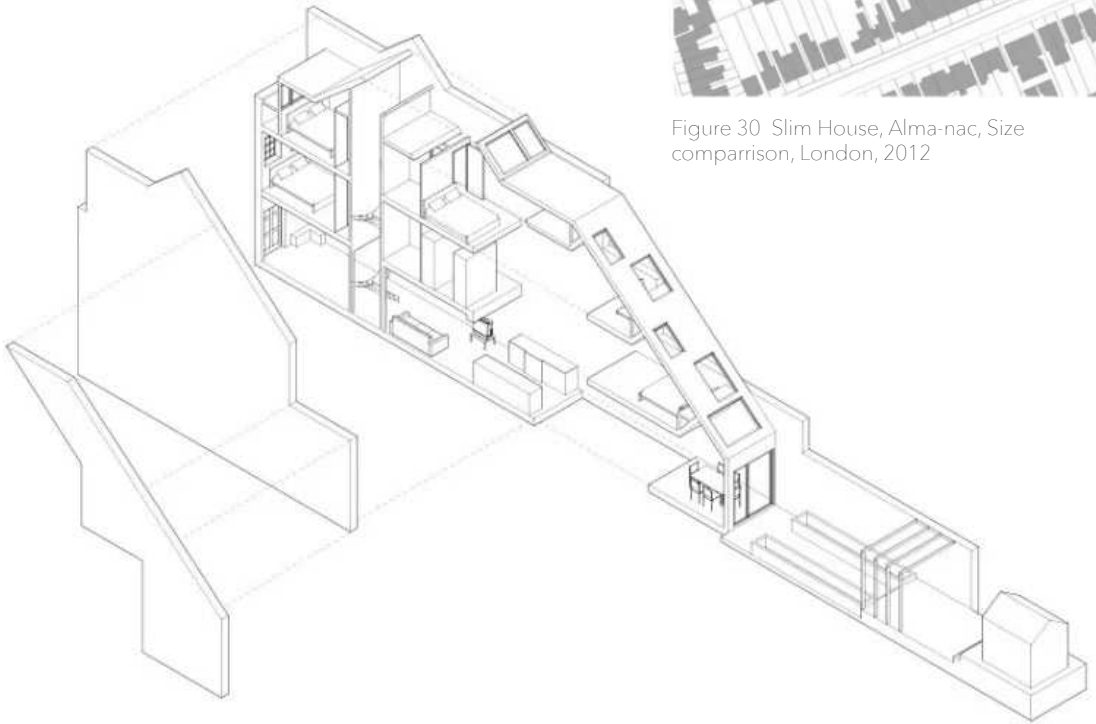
Slim House, Alma-nac,, Spatial utilization elevation, London, 2012
